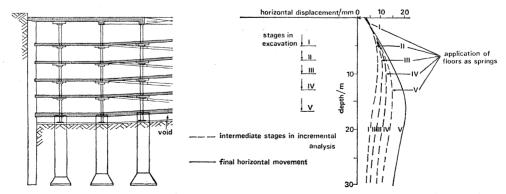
Car park at Westminster showing construction stages of excavation and corresponding horizontal displacements of the retaining wall.
